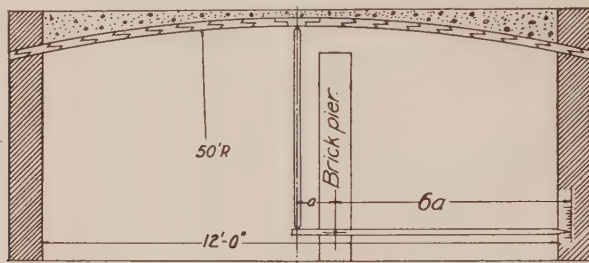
CROSS-SECTION OF STRUCTURE SHOWING ARRANGEMENT OF DEFLECTION APPARATUS.
